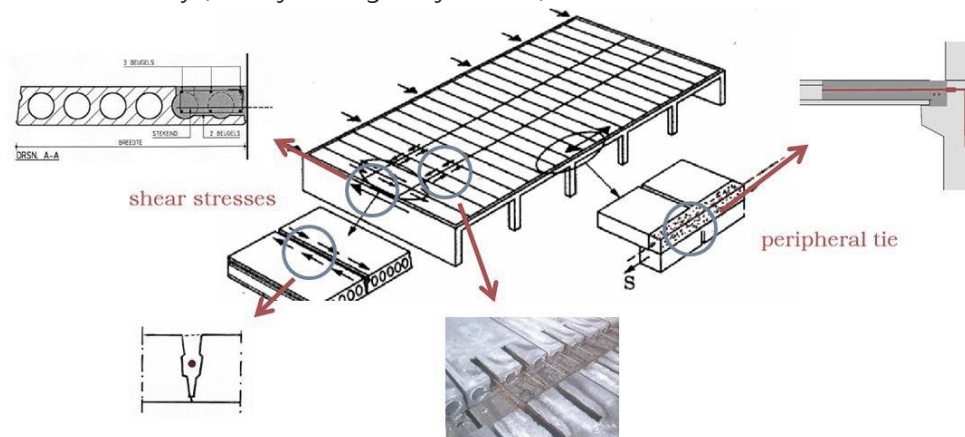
Longitudinal and peripheral joints in hollow core floor slabs
